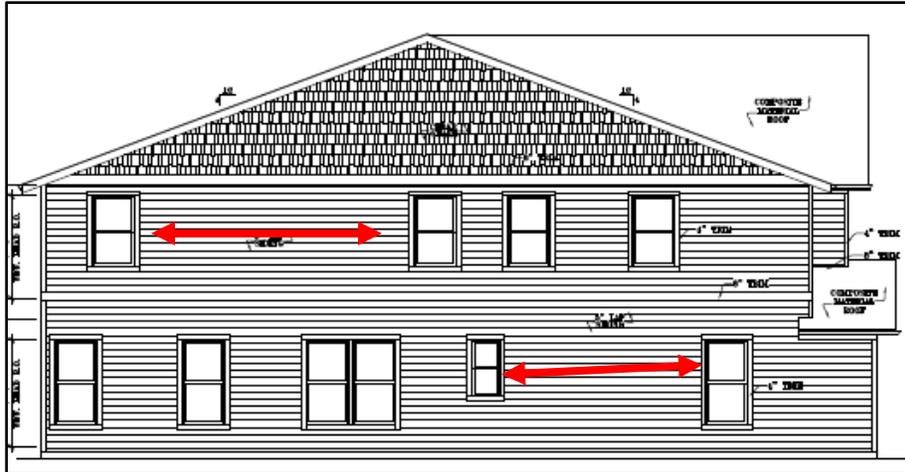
Side elevation – note the shallow roof slope. Arrows indicate locations where windows should be added.
